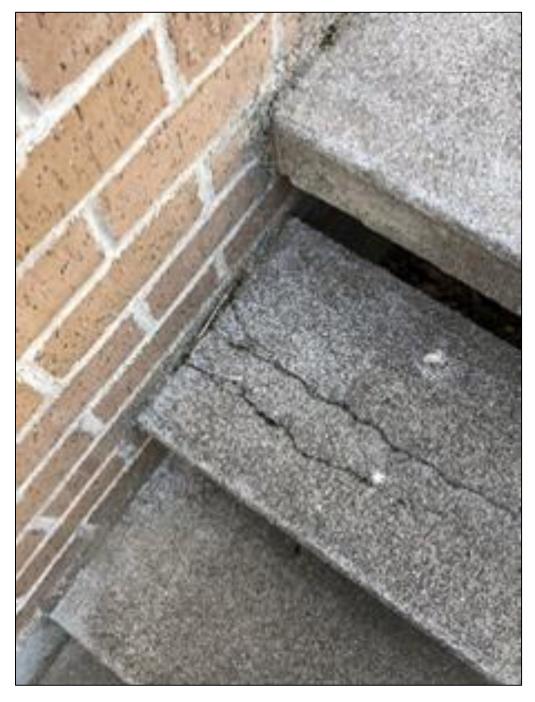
Fire Hall - Broken Stairs on North Door Landing
